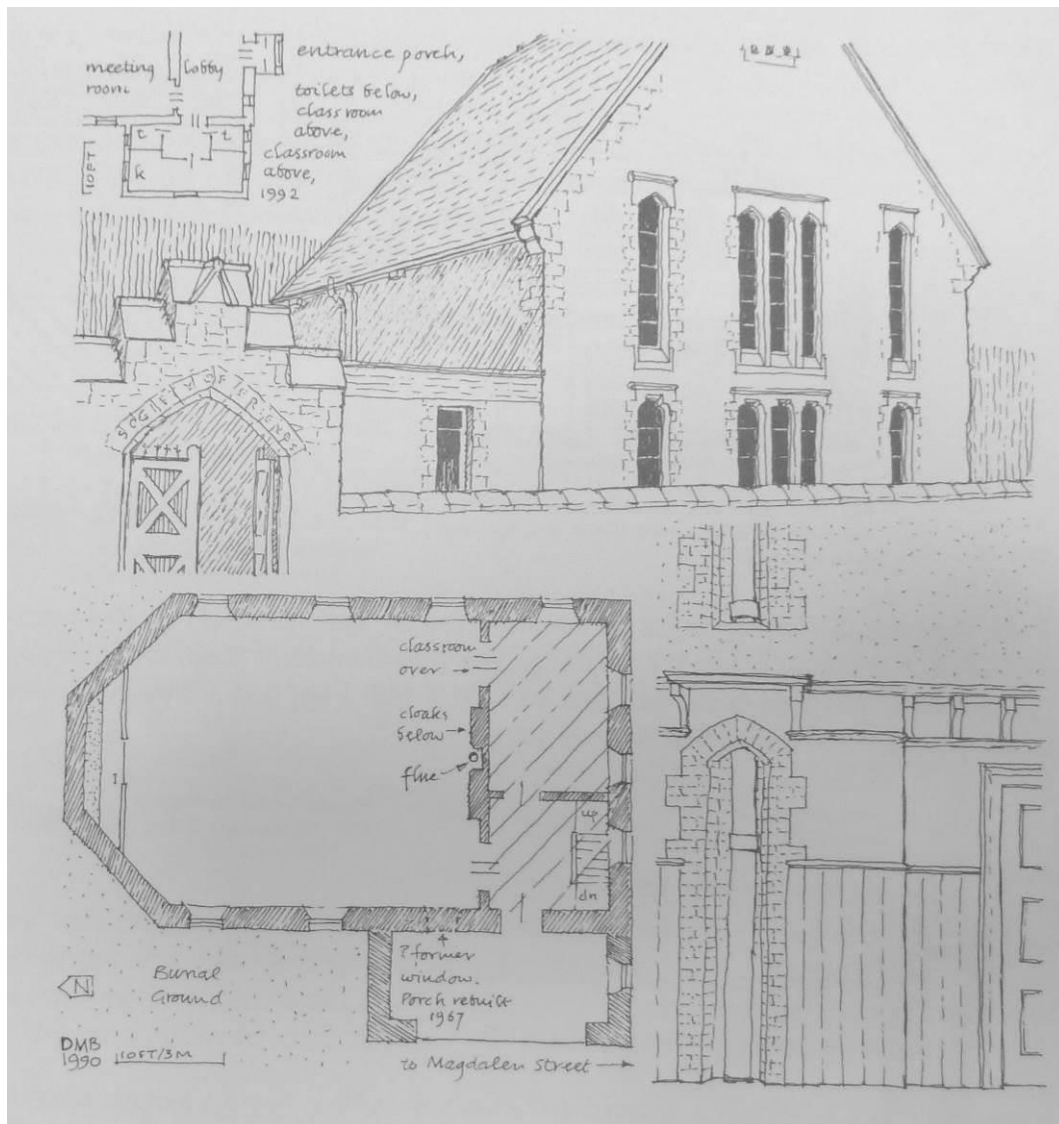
Partial ground plan above (post-1992), full ground floor plan below (pre-1992), perspective and details, including the former gate which now part of the porch (north is to the left on the plan; not to scale) (Butler, vol. 1, p. 137)
